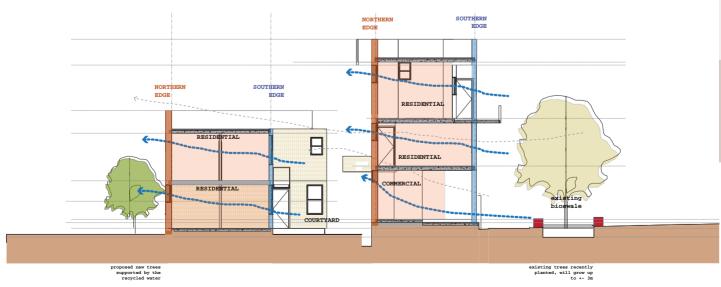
Section showing the distance for cross-ventilation and the different applications of masonry construction for the Northern (thermal bank wall) and the southern wall. Author, 2017
